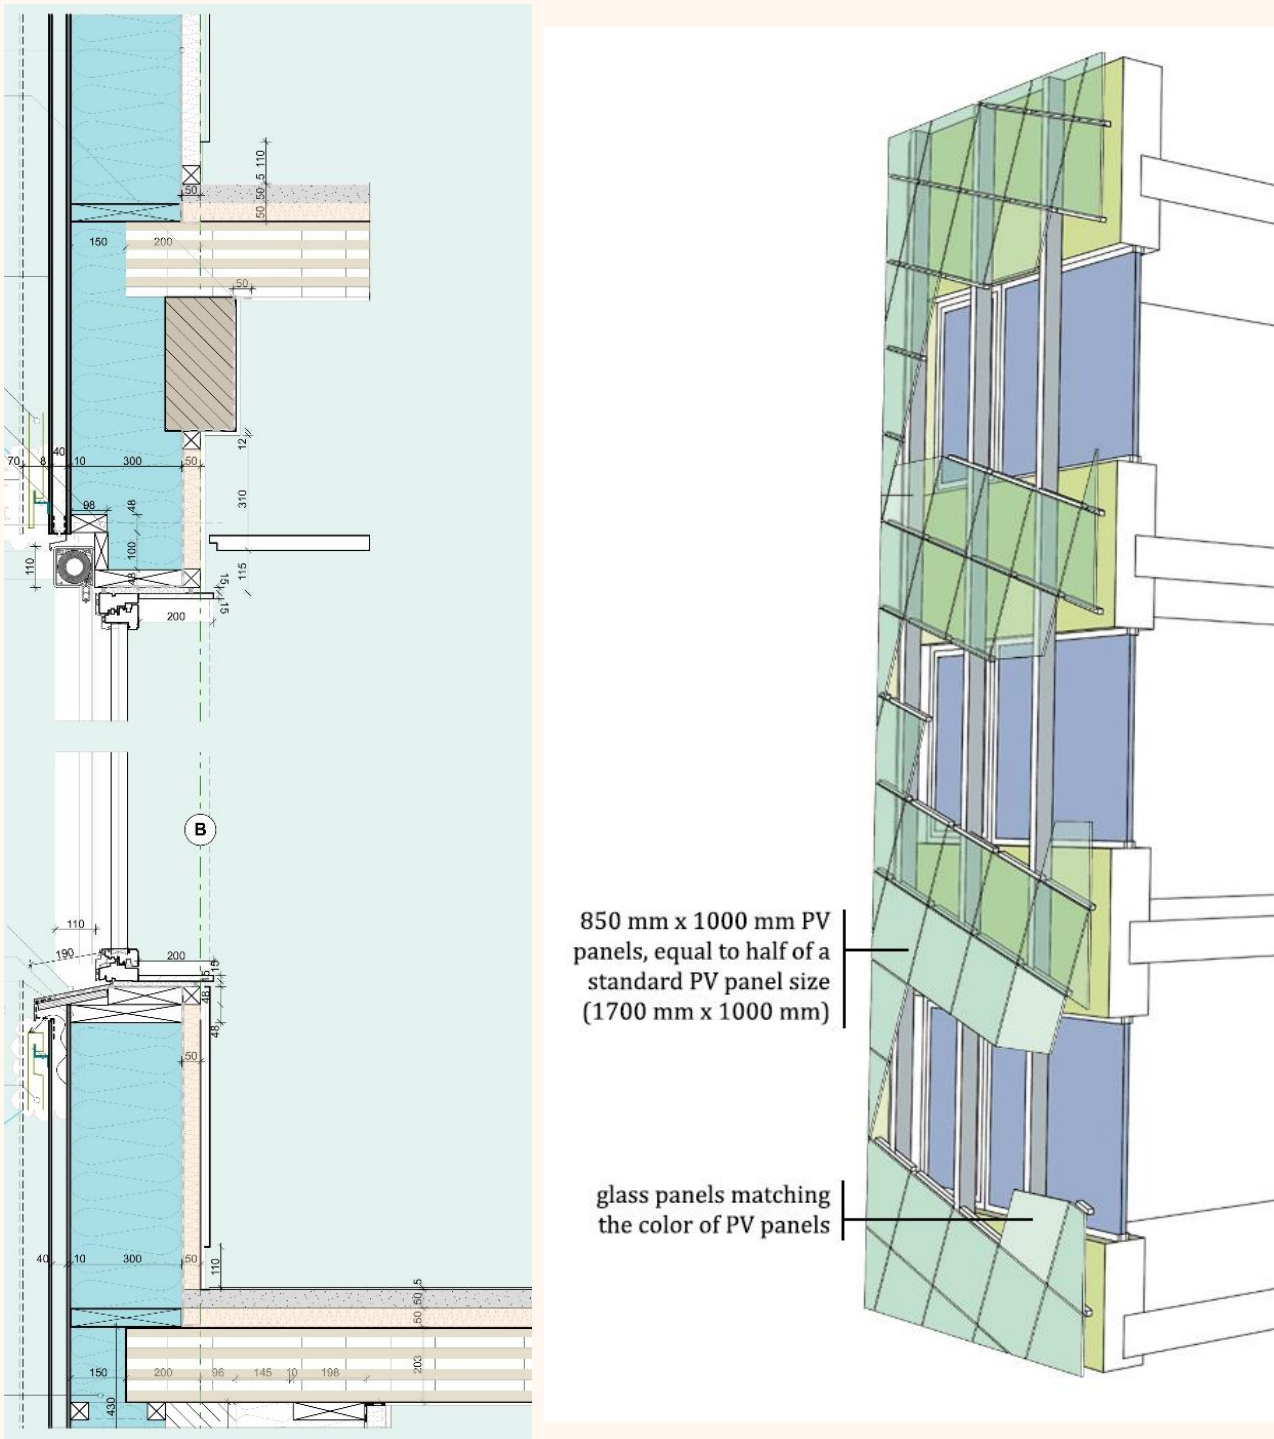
Left: technical section of the school façade. Original image by KONTUR and SPINN Arkitekter, edited by Jesus Daniel Garcia Melo (NTNU). Right: Scheme of the installation of the PV panels on the school building façades. Original image by KONTUR and SPINN Arkitekter, edited by Nicola Lolli (SINTEF).
